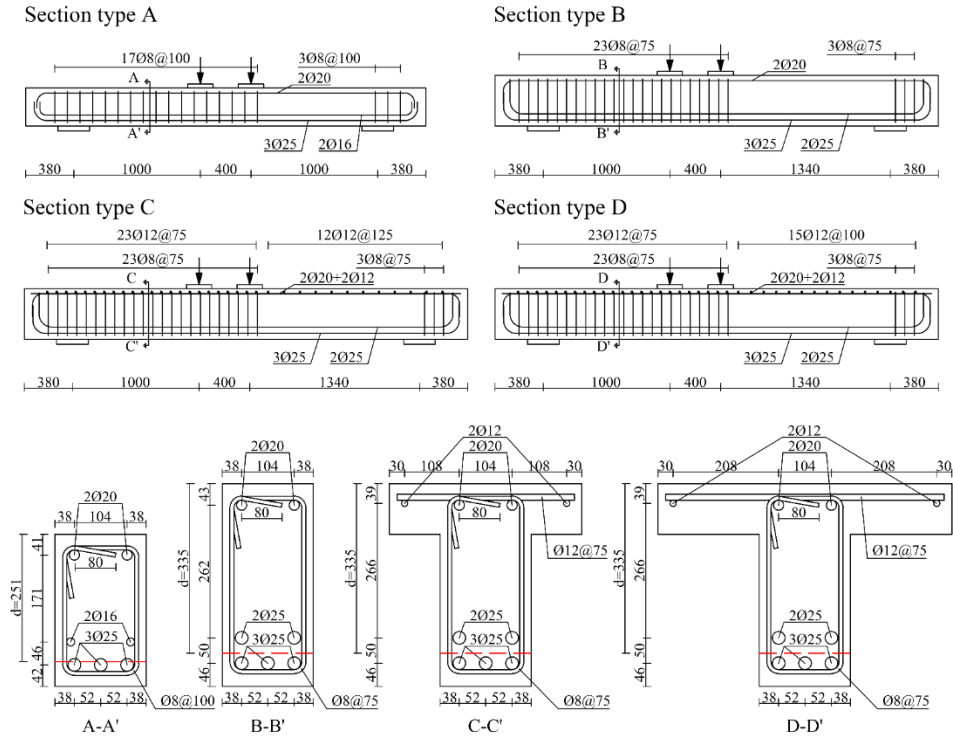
Dimensions and reinforcement of beams with section types A, B, C and D (dimensions in mm).
